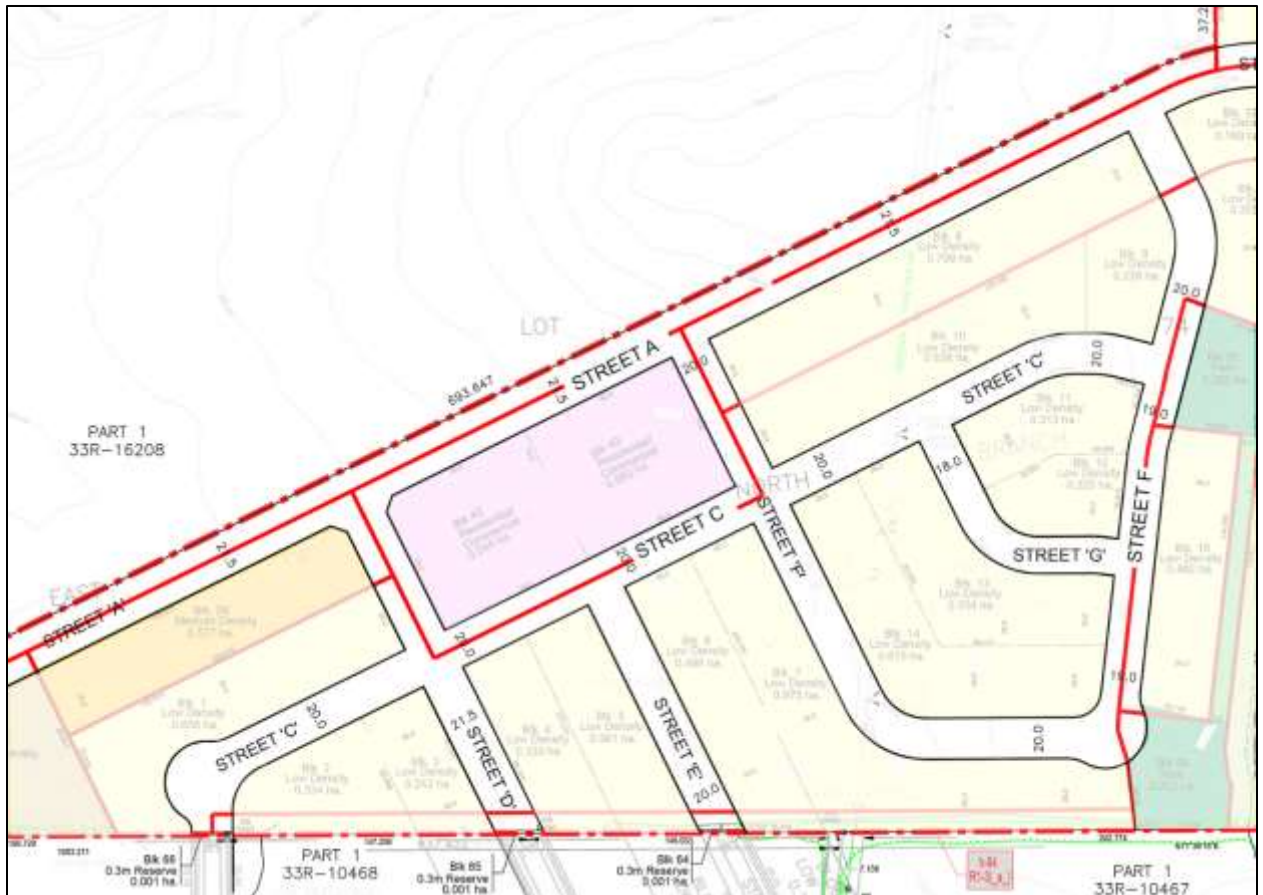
Street C, D, E, F, G (local streets/neighbourhood connectors)
